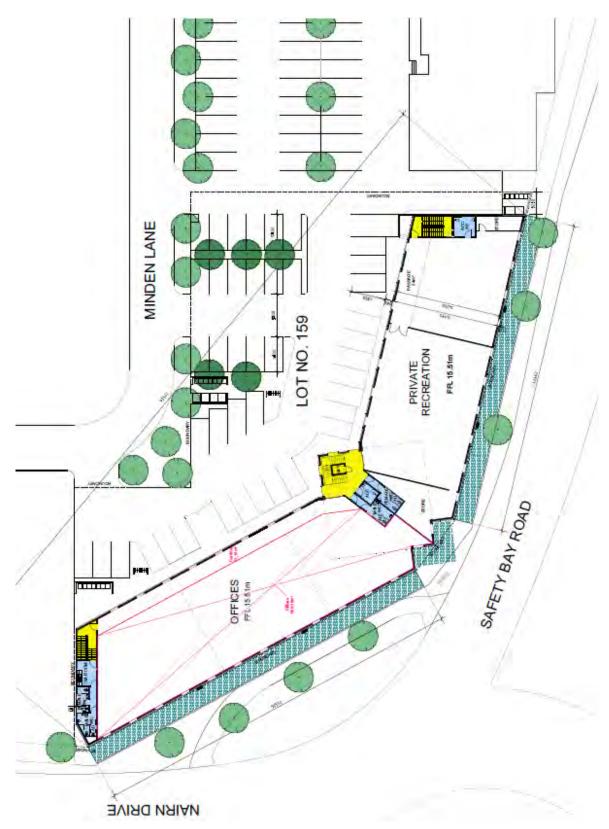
Revised (Current) First Floor Plan (8.6.2015)
